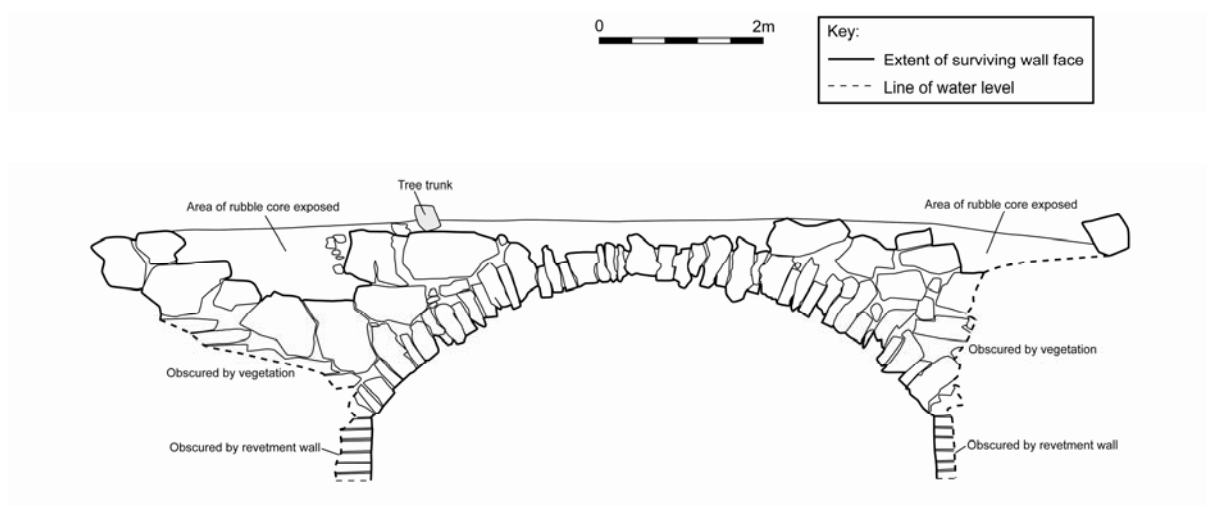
Structure 4, Rusticated Bridge #2 (Lower Bridge): Elevation a
